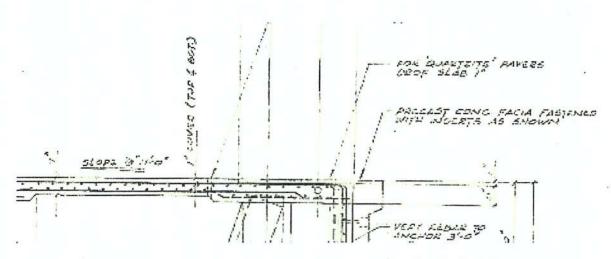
Slab Detail 1973 Drawings (Courtesy of Public Works)
